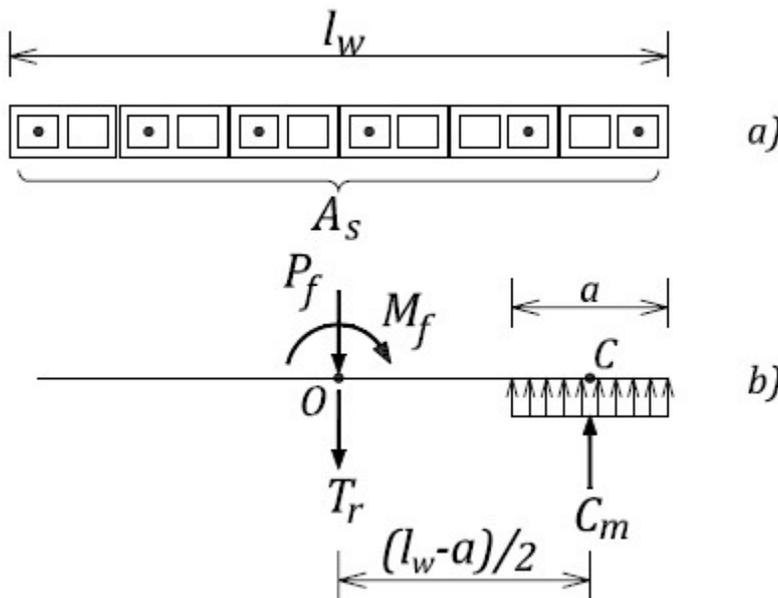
Reinforcement estimate: a) plan view wall cross-section; b) distribution of internal forces.
